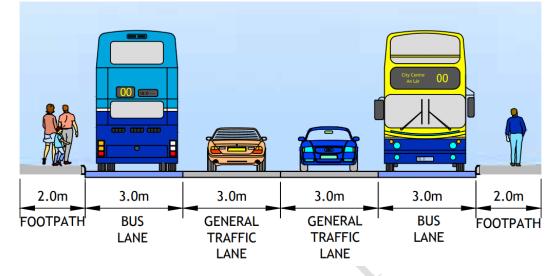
Cross-Section A-A (relevant to RG1, RG2, RG3, RG4 & RG5)
